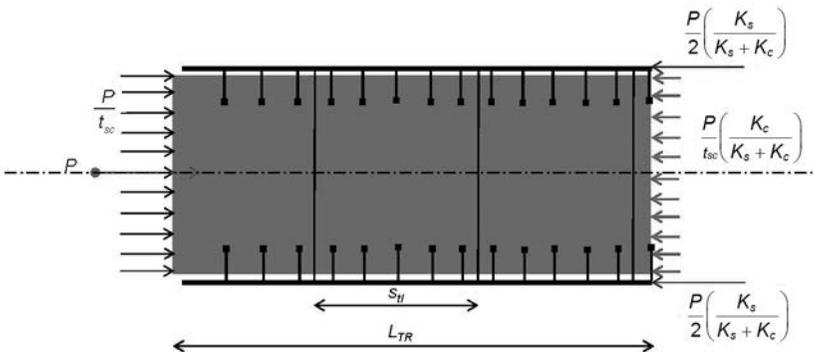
Load applied to concrete only, resisted by composite section.
